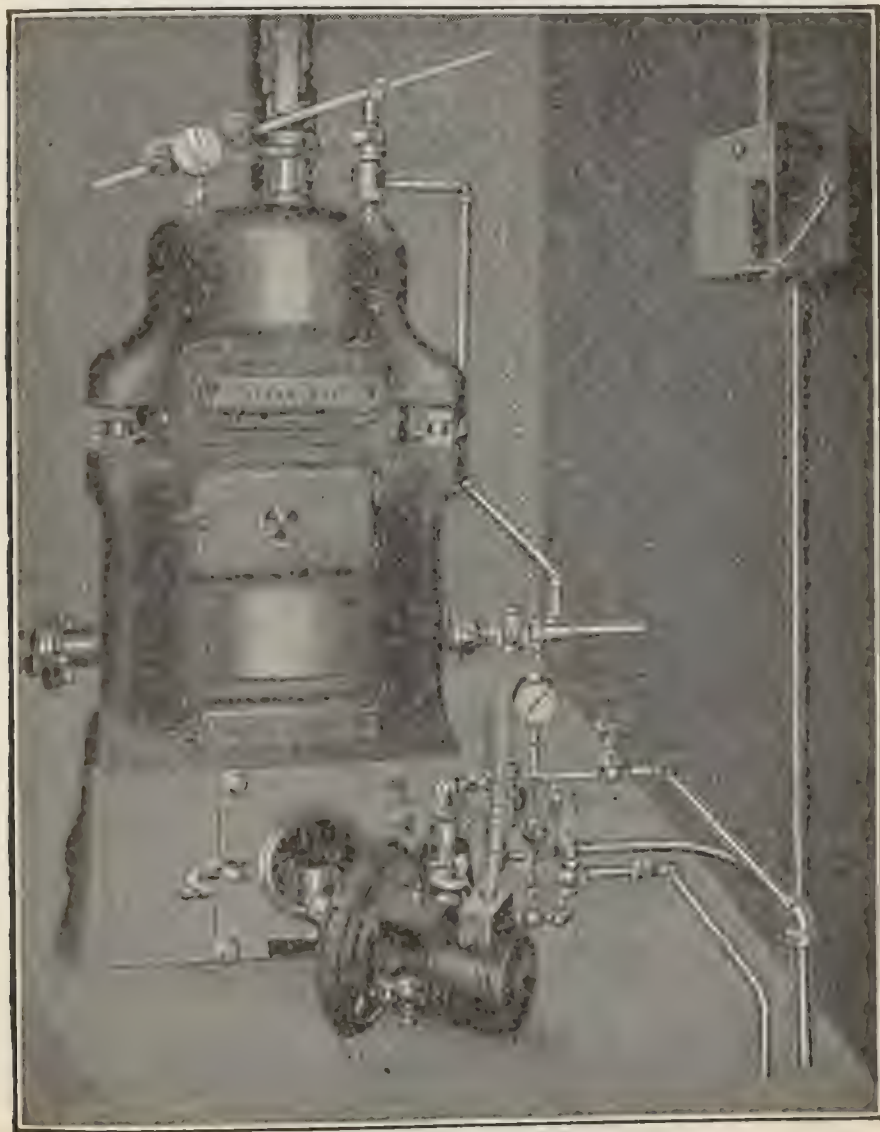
,913 — Johnson rotary burner with d.c. motor operating a cast iron steam heating boiler with automatic control.
